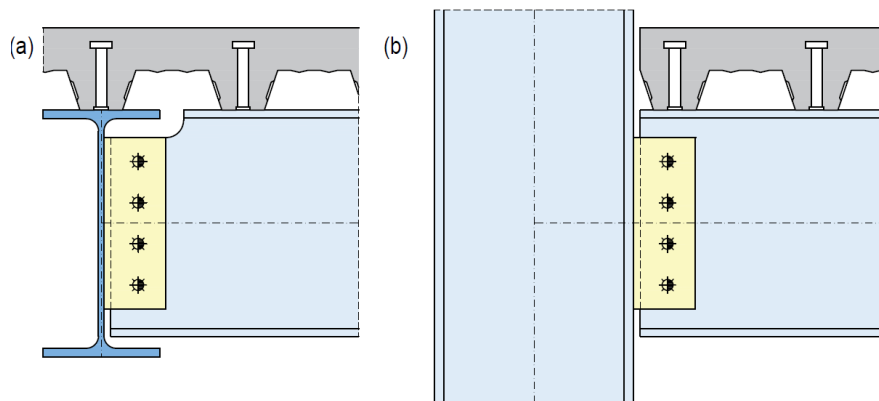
Nominally pinned joints: (a) between steel-concrete composite floor beams, (b) between secondary floor beams and columns
